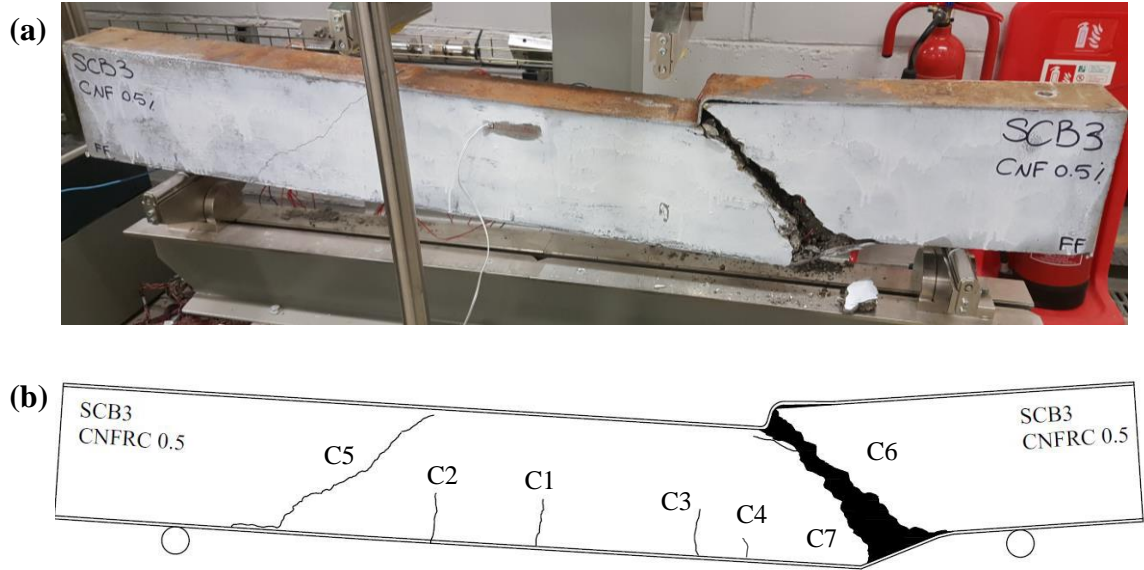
SCB3: (a) specimen after failure; (b) crack map of failed specimen
